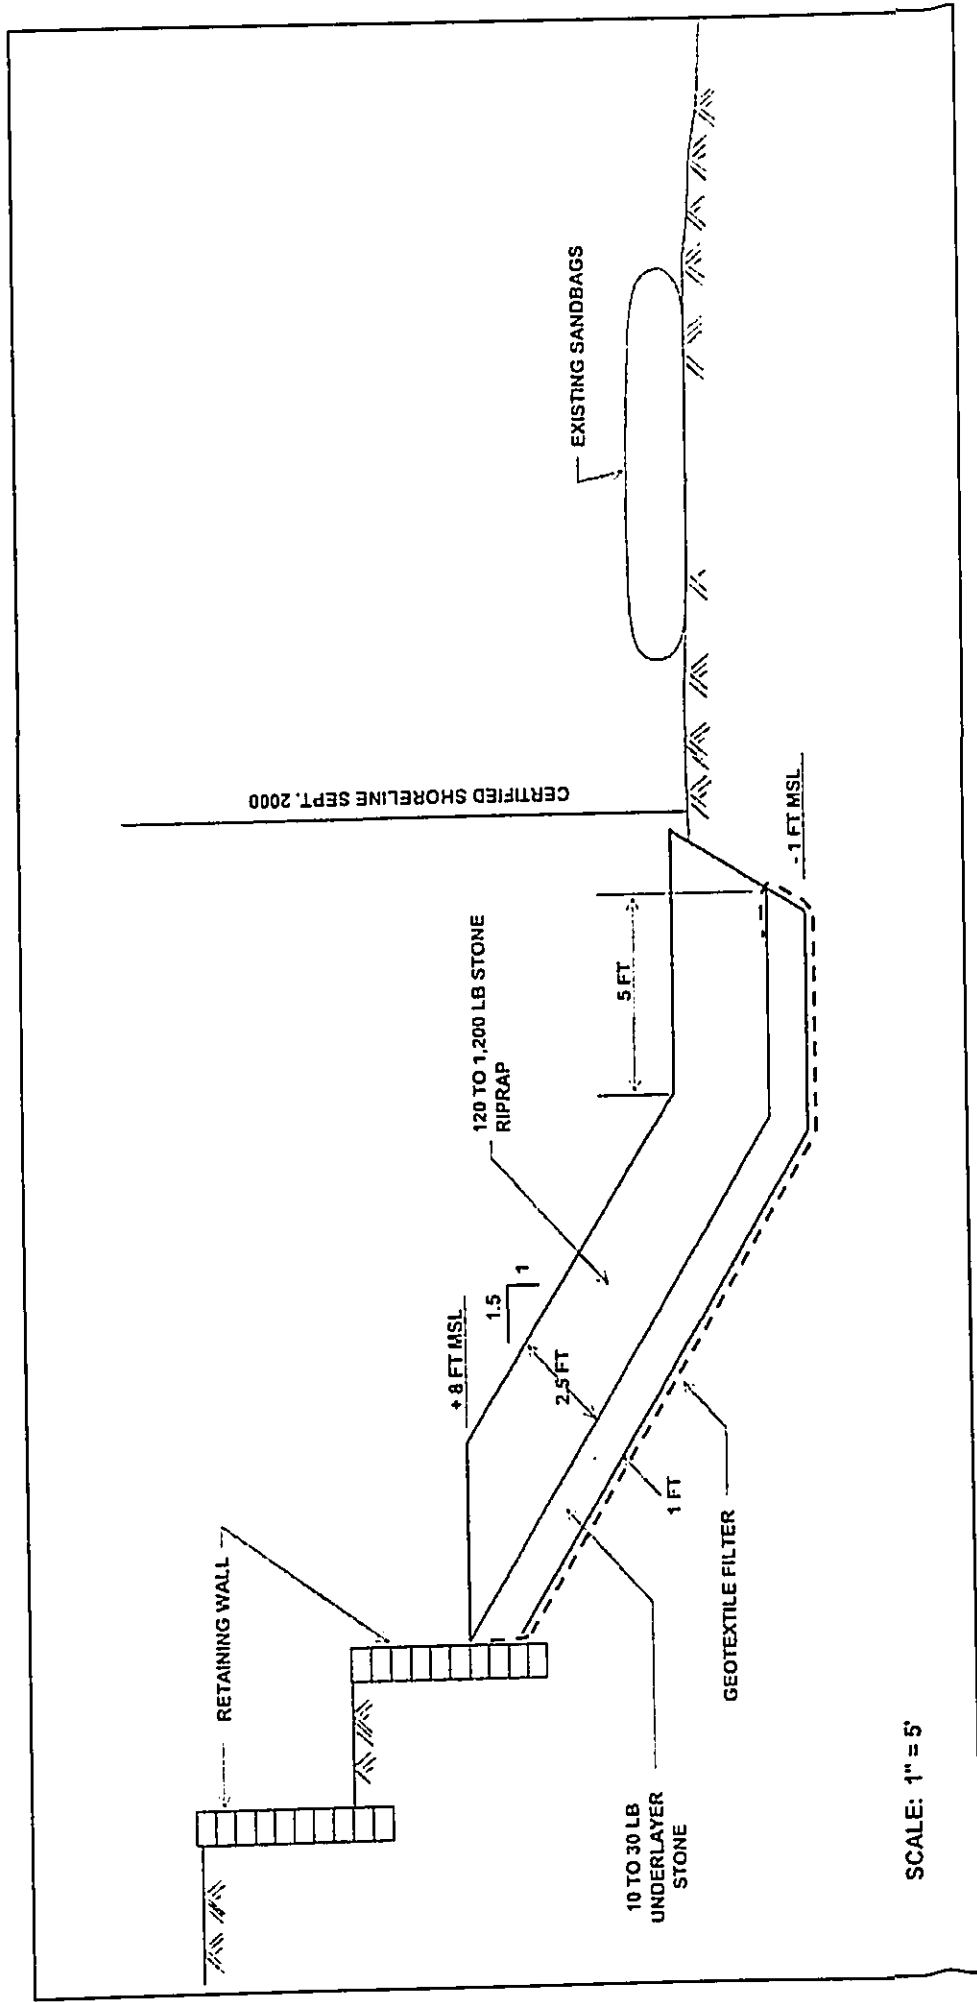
SHORE PROTECTION REVETMENT TYPICAL SECTION
